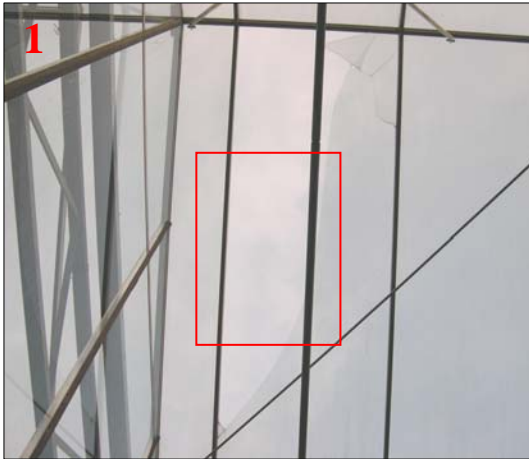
A hole in a glass pane in the glasshouse roof acts as a 'chimney' where heat escapes.
